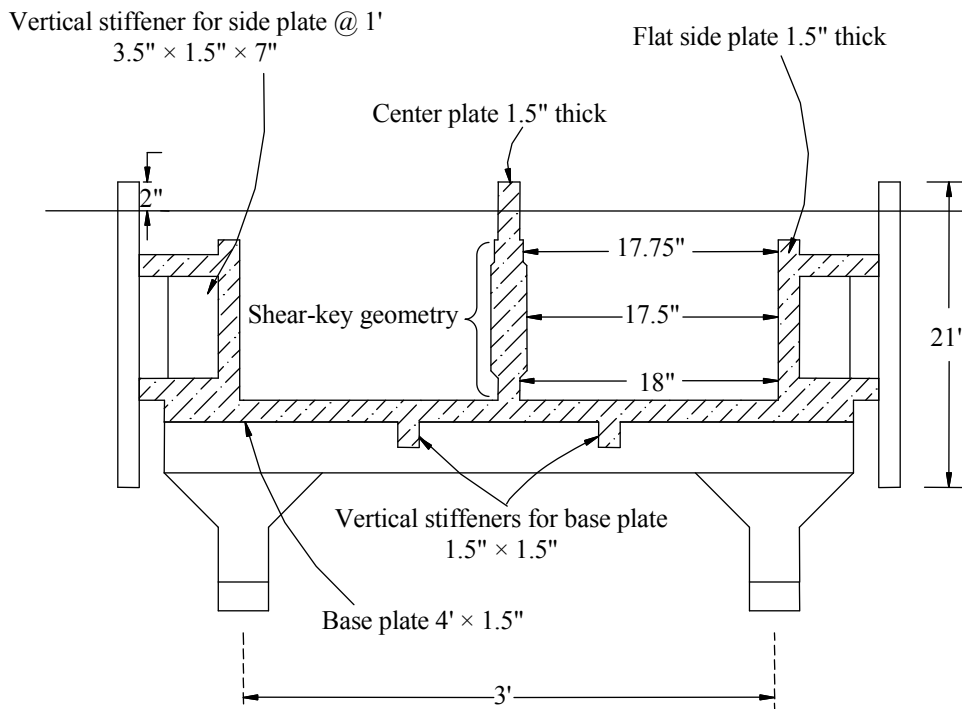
Cross-section of the formwork for the exterior box-beams.
